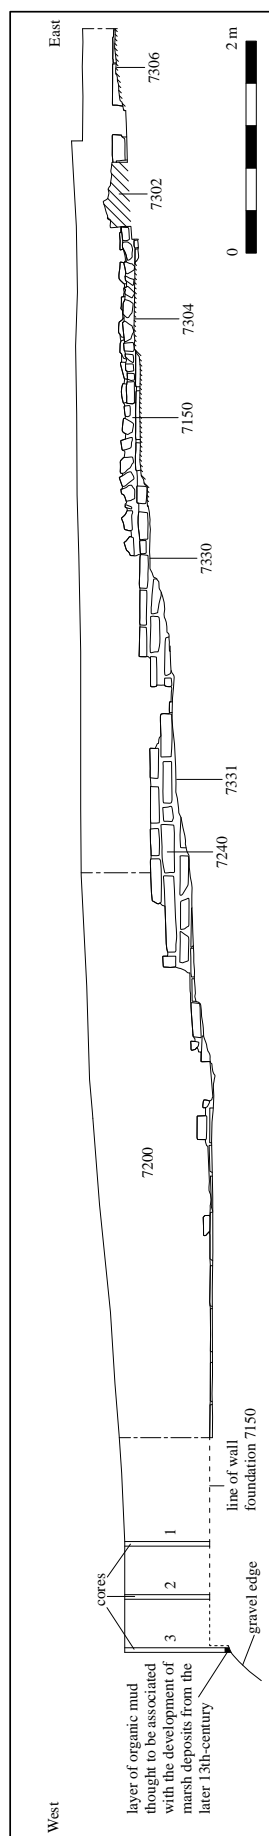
Elevation of the north wall of the marine entrance with information from the core samples. For the position of the cores see Fig. 4.2
